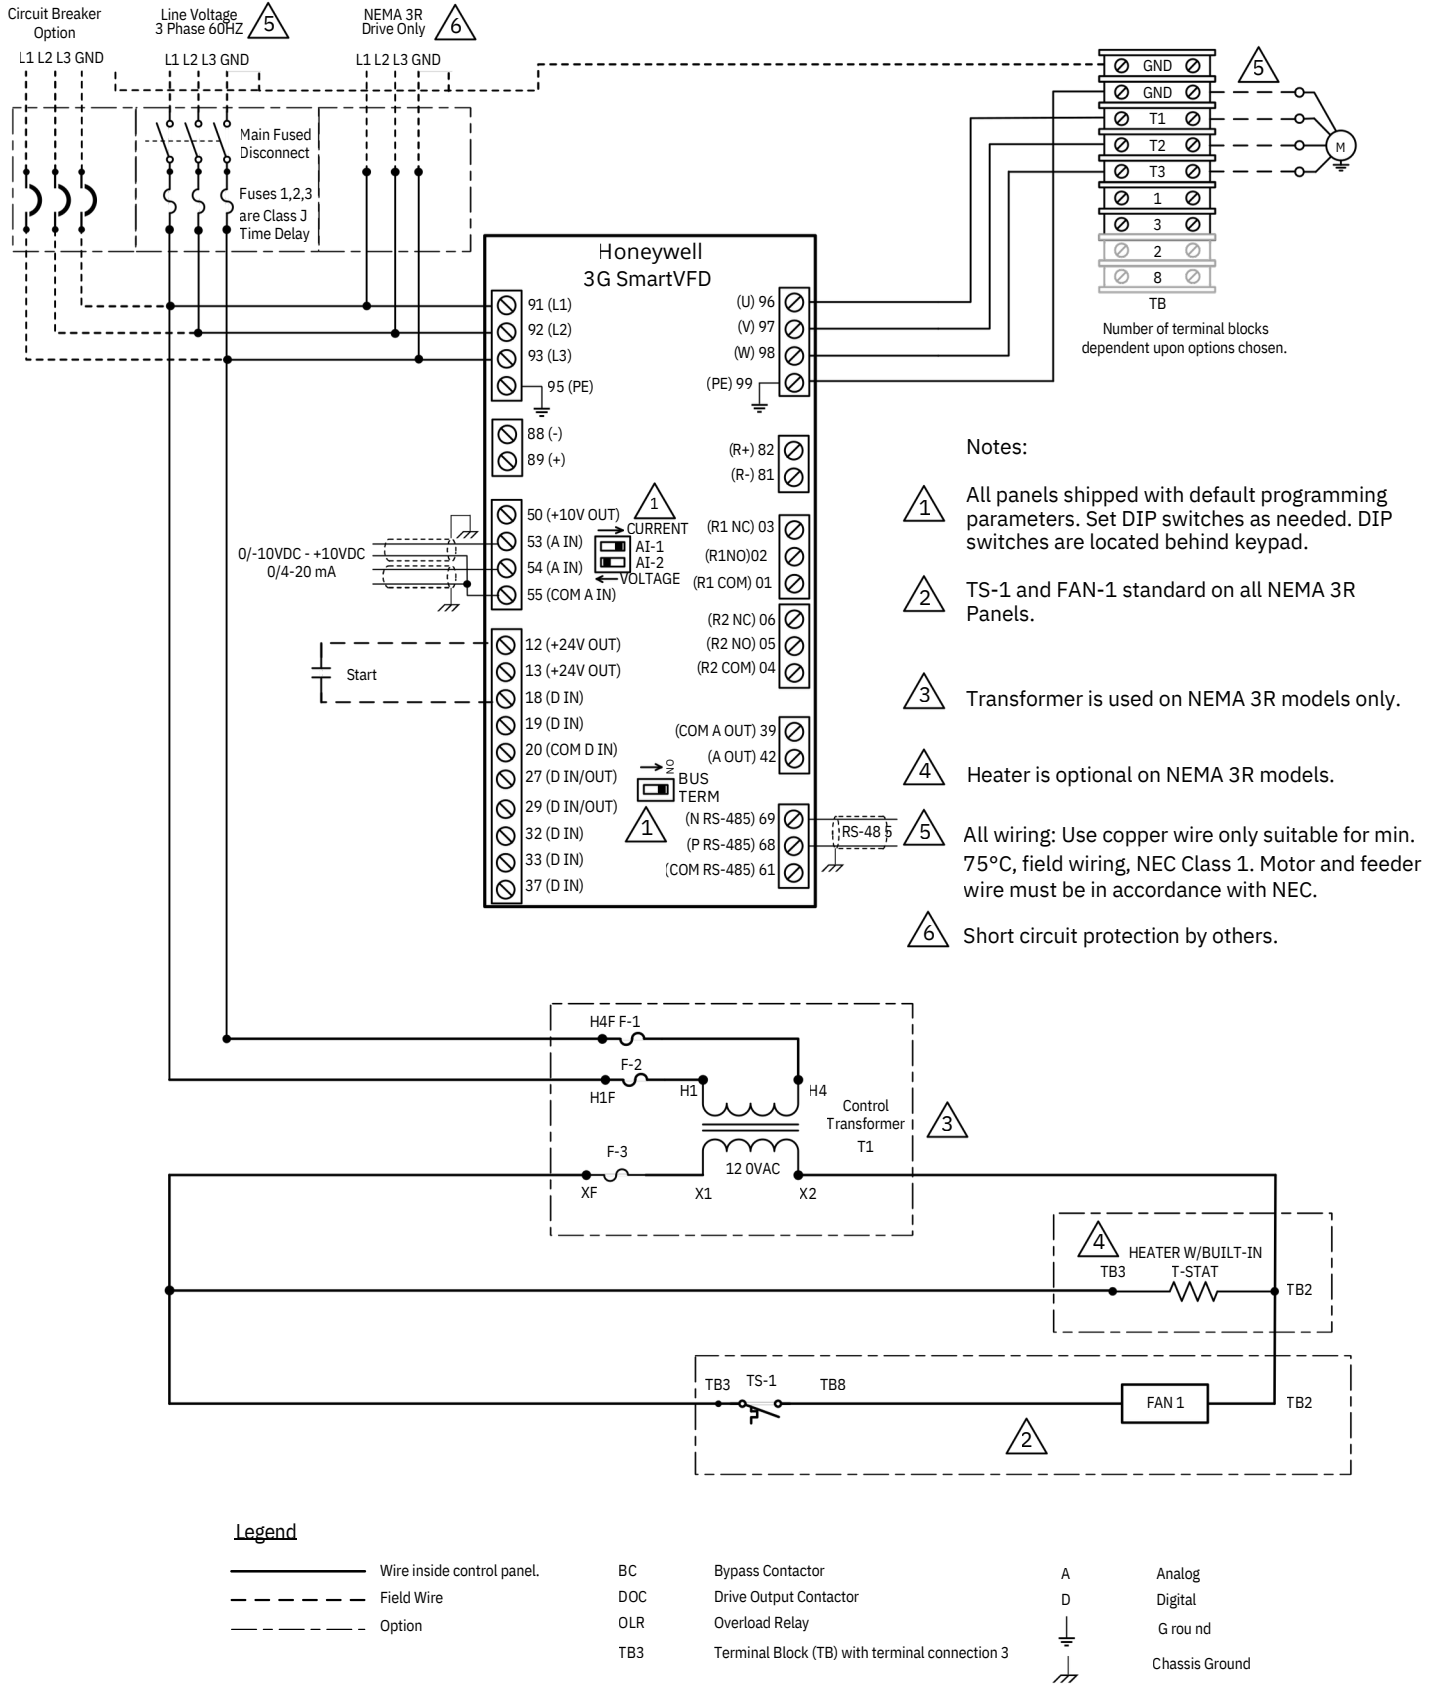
Frame D: Fused Disconnect, NEMA 3R Drive Only Wiring Diagrams.
